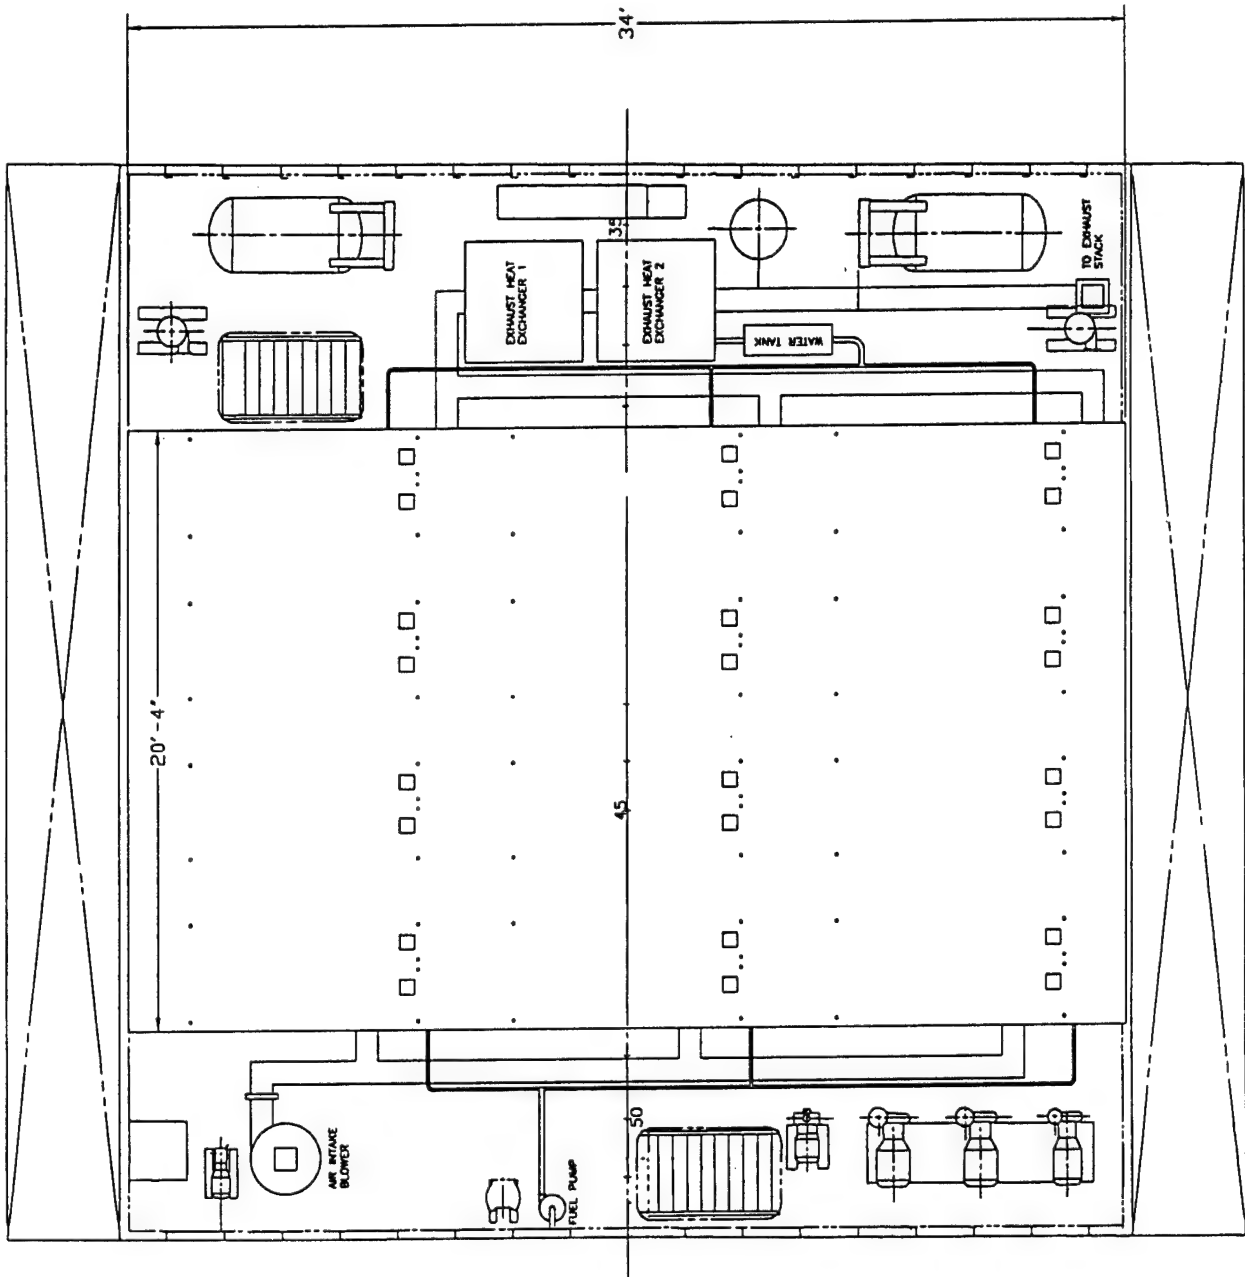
12 FUEL CELL MODULES IN PLAN VIEW ON "FLOOR"/DECK
